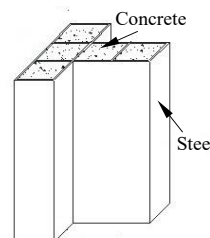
Typical T-shaped multi-partition steel-concrete composite column.
